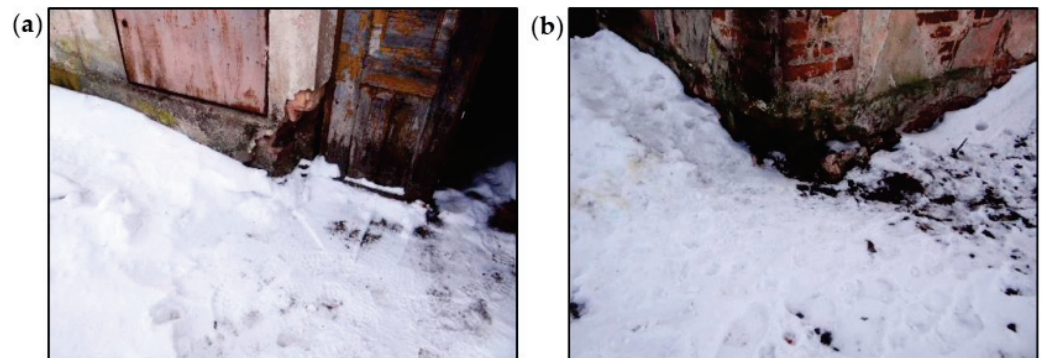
View of defects in external brick walls: (a) near a door opening and (b) in the corner of the building.
